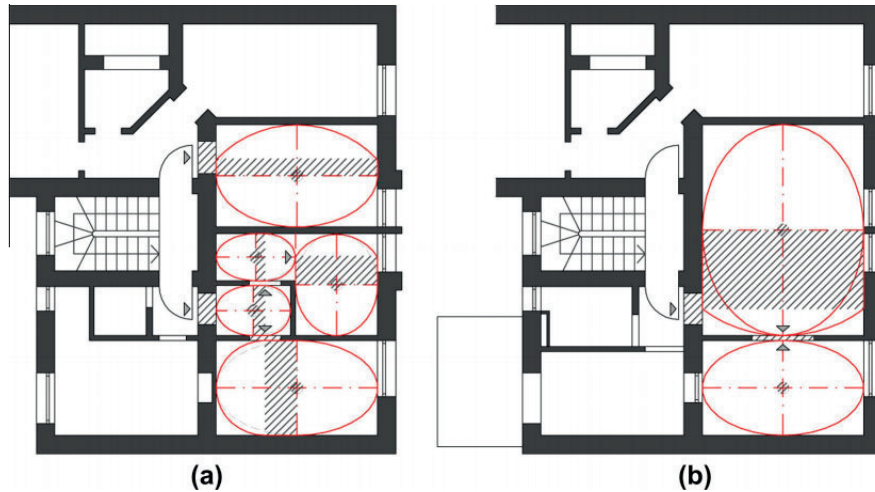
Concavity of the living room in a residential building. Plans of the first floor before (a) and after the dwelling renovation (b). Cologne, Germany. © [detail]. Reproduced by permission of detail.
